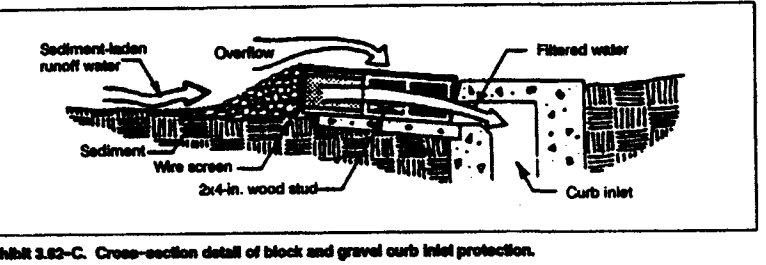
C. Cross-section detail of block and gravel curb inlet protection.
